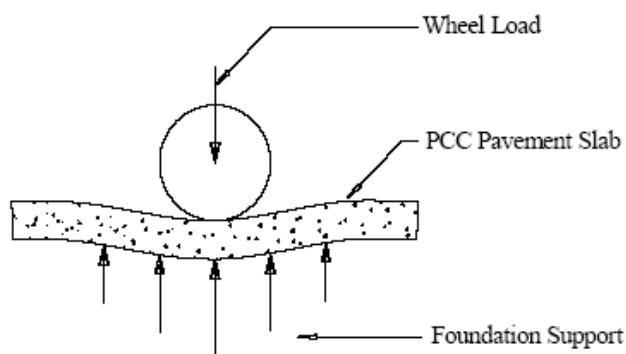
2: Transfer of Wheel Load to Foundation in Rigid Pavement Structure
